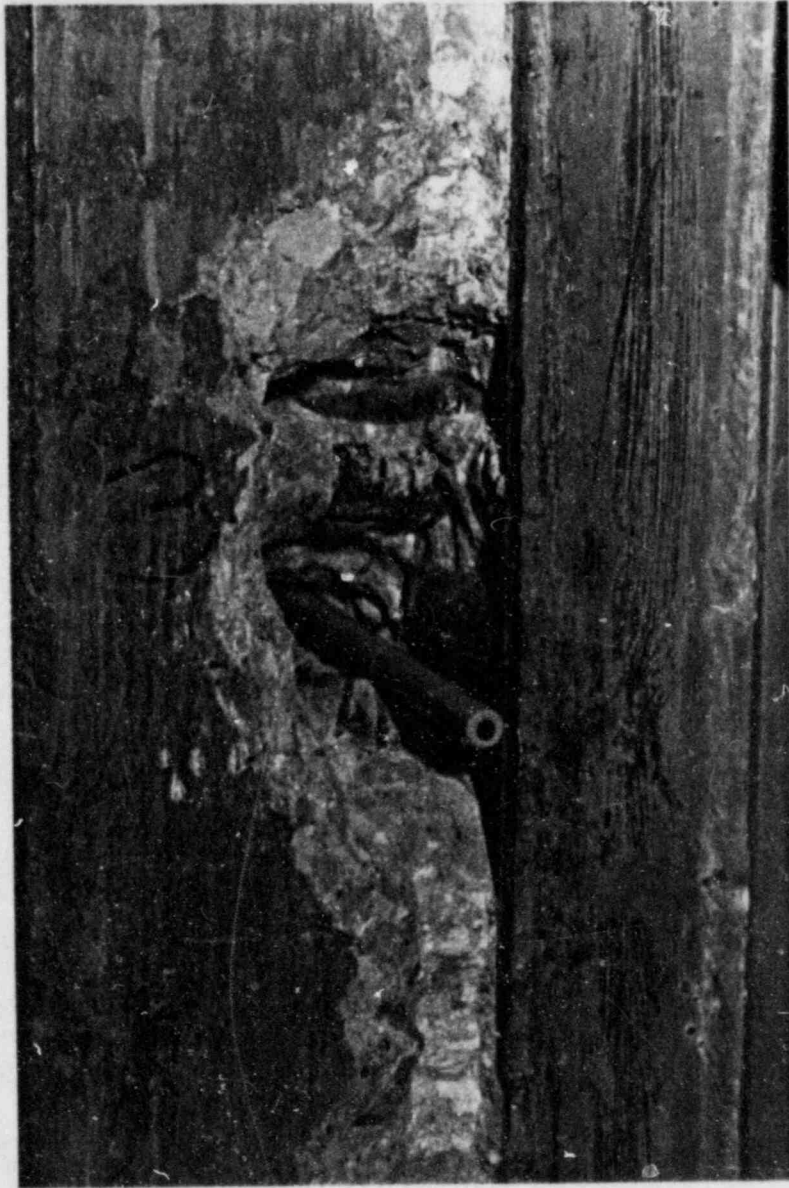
Torus support structure on elevation 540 ft.
